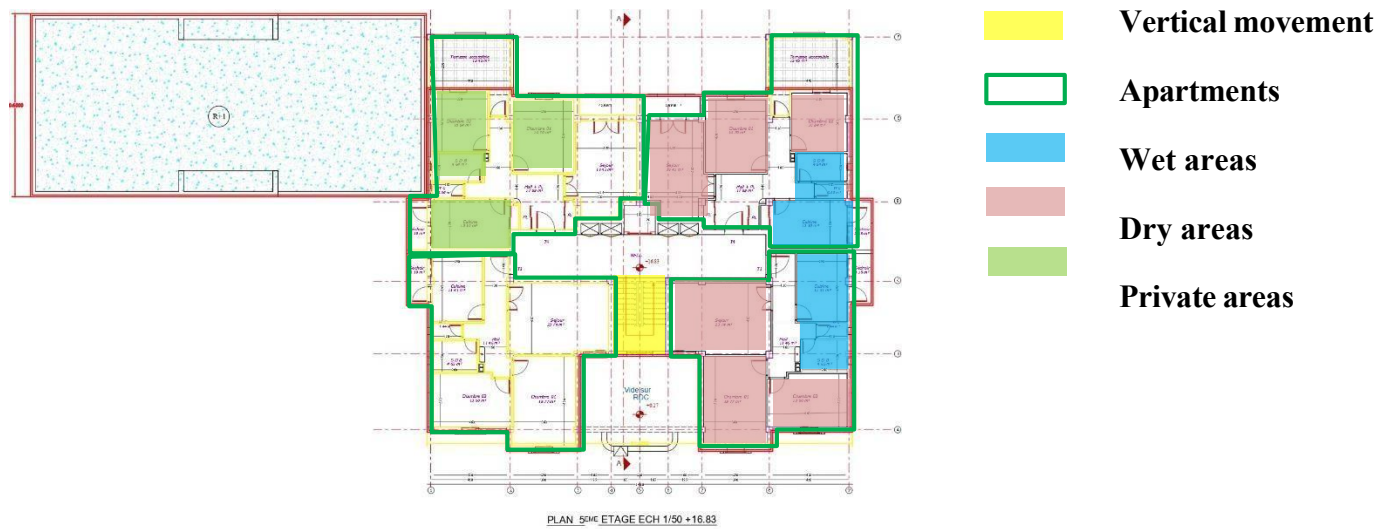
Fifth Floor Plan (Source: design office Nebar Omar +Author treatment , 2025).
